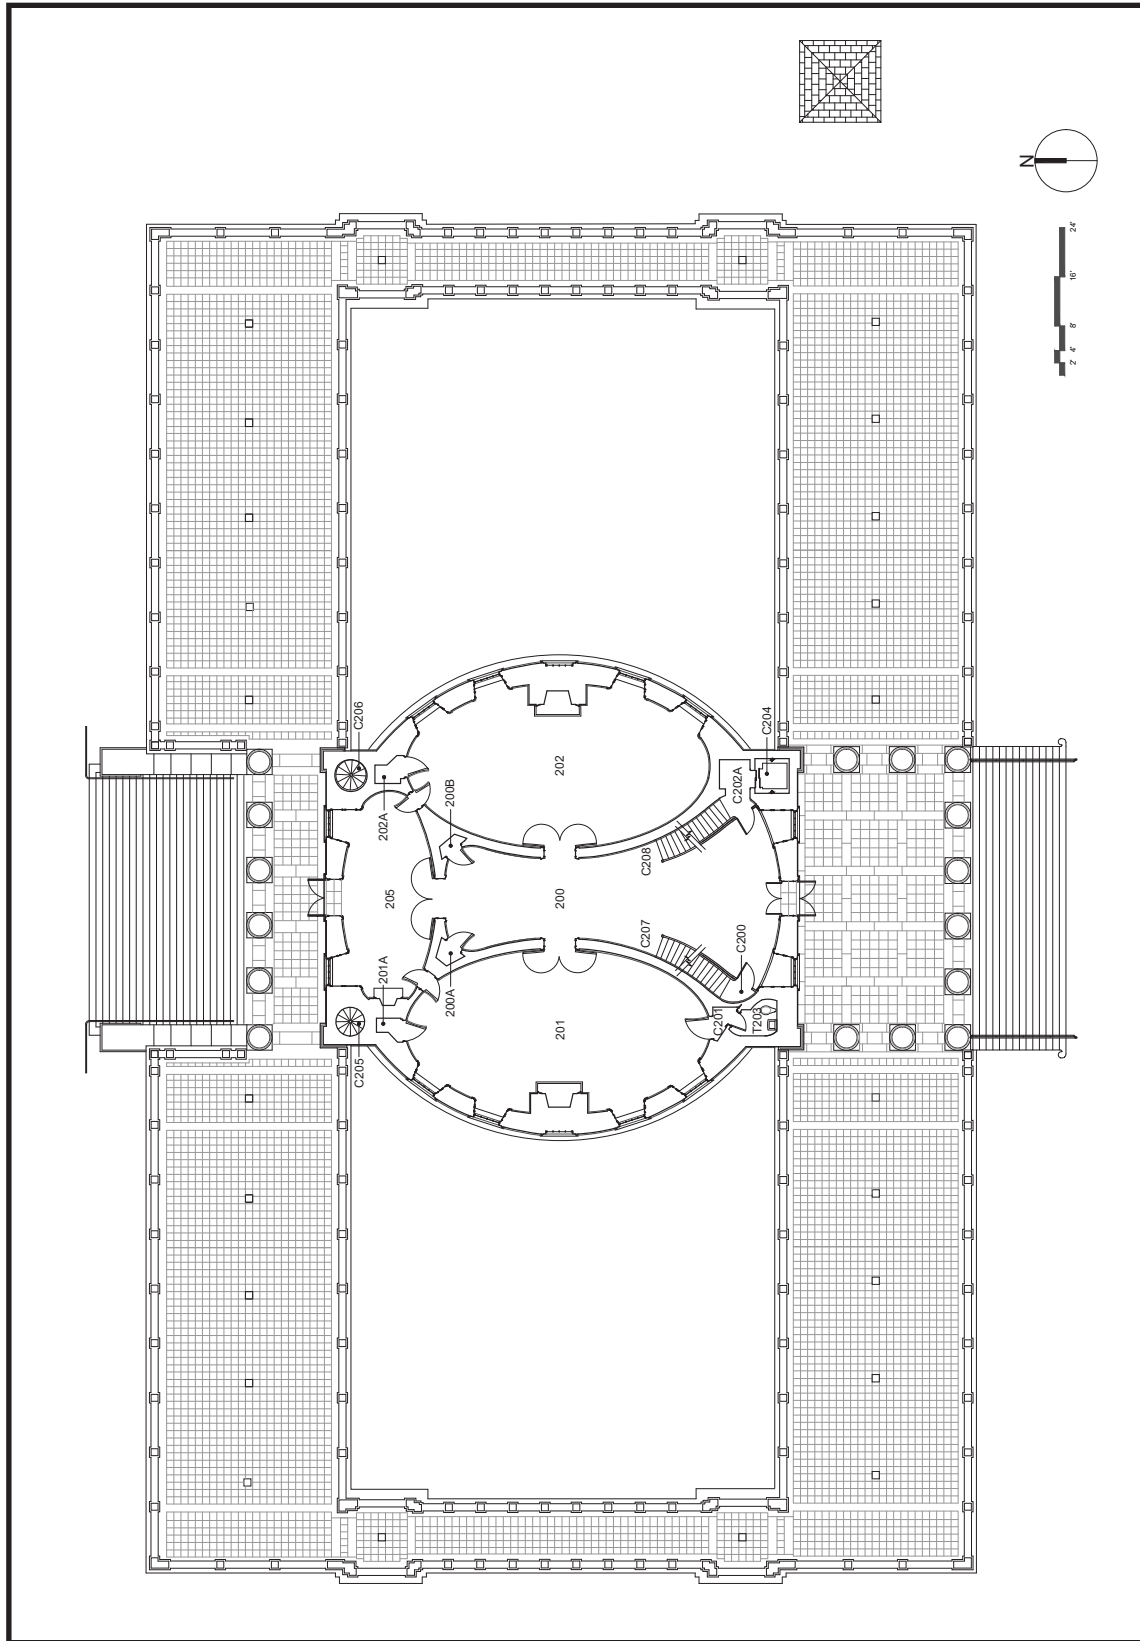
Plan of the main floor. Drawing by John G. Waite Associates, Architects, 2022.
